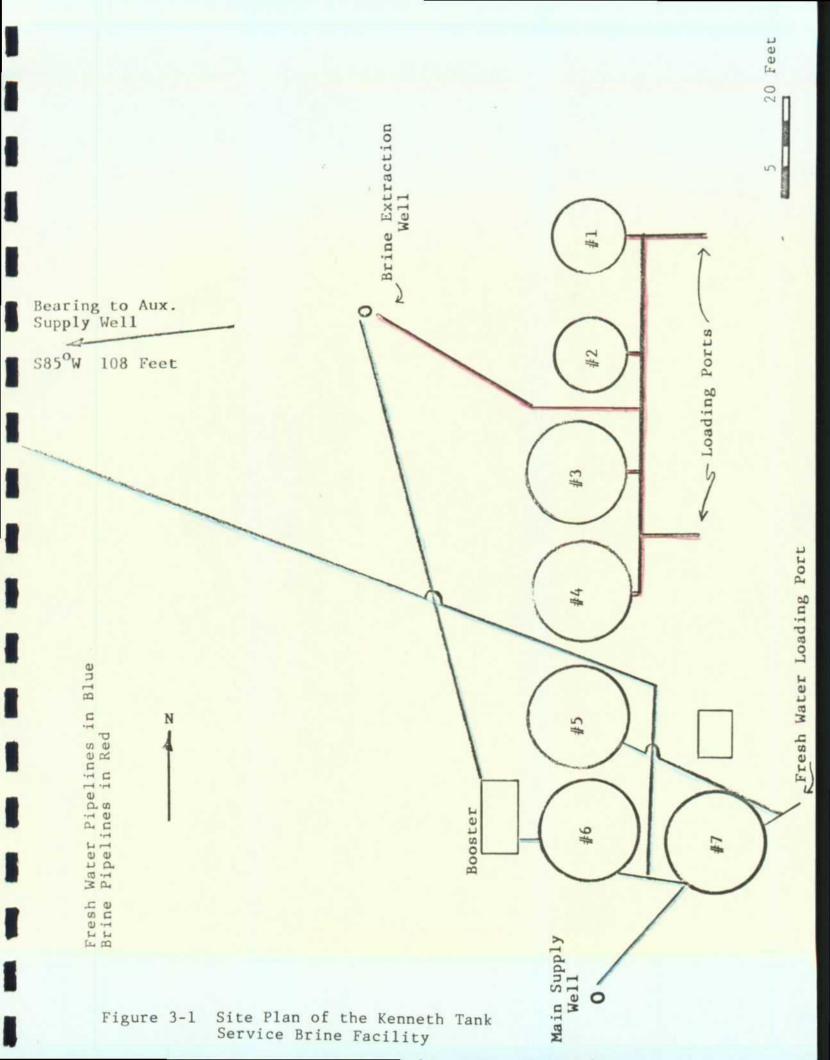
is the site plan of the facility which shows all of the above structures.
